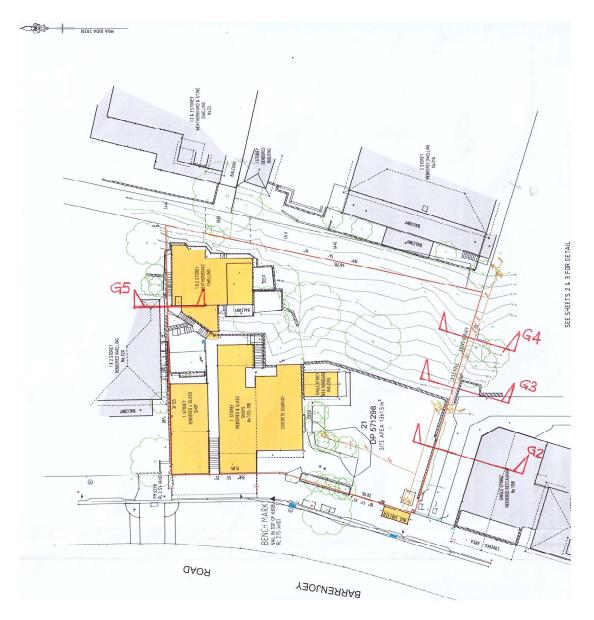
Section Locations (Base Survey Plan by Beveridge Williams).
